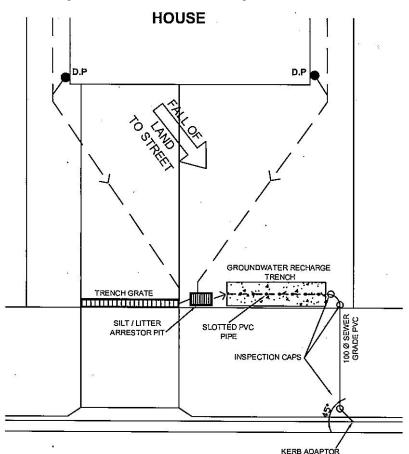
Example Groundwater Recharge Trench Layout - Fall to Street
